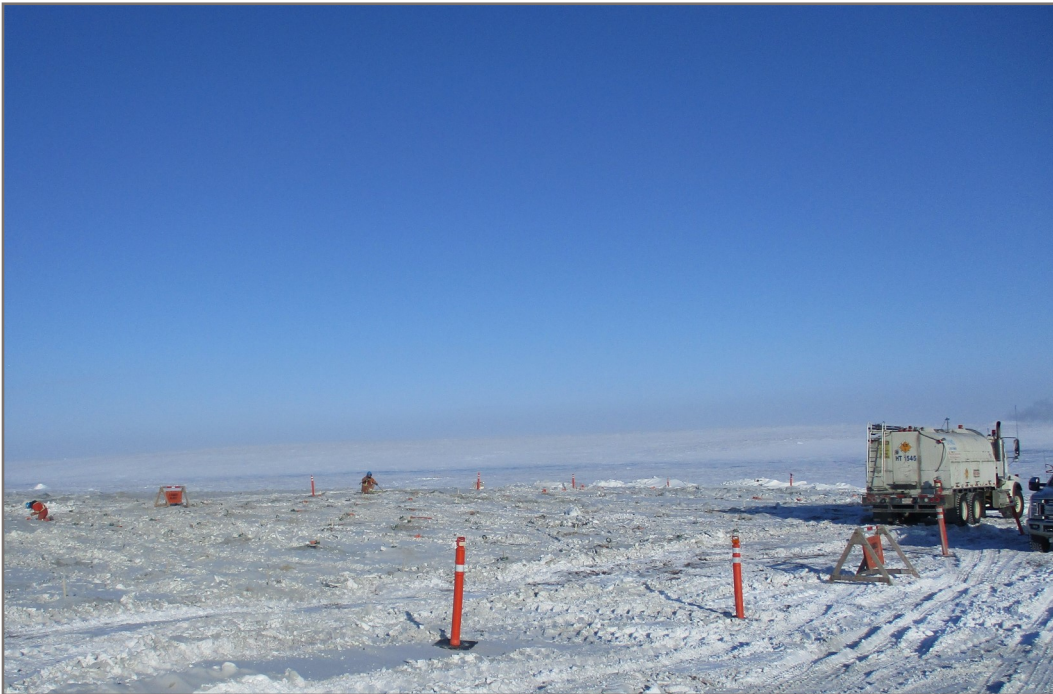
2022-02-25 Pond CP2—Loading emulsion for first blast pattern; view facing northeast
